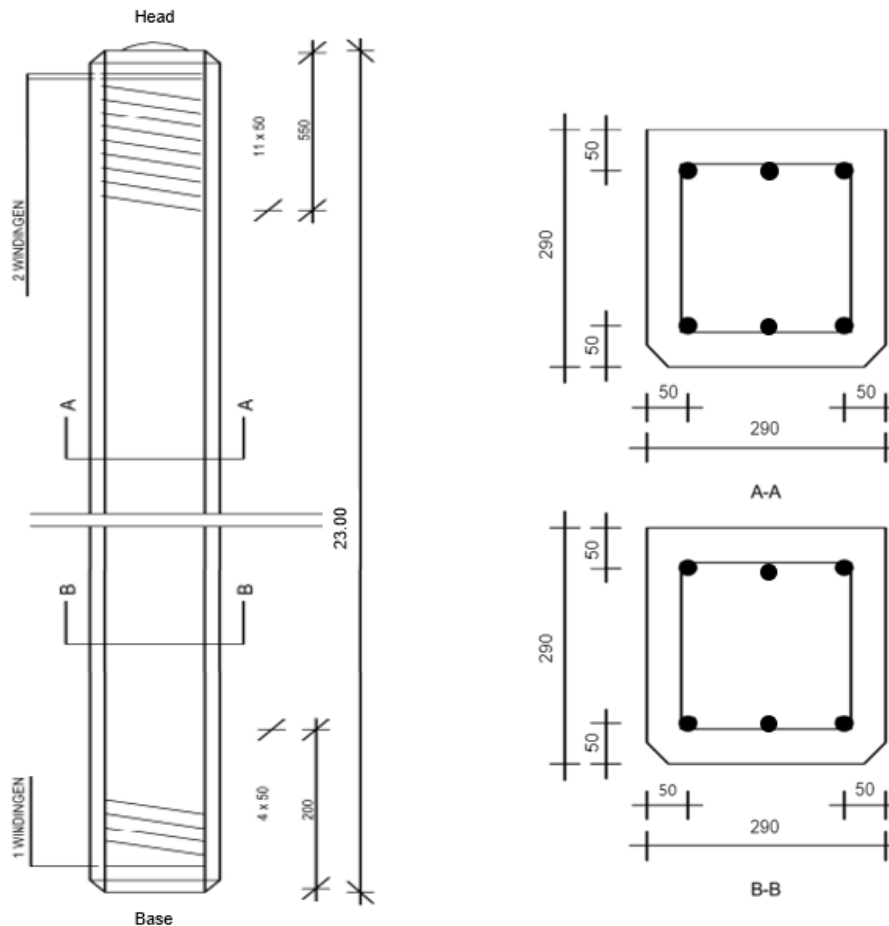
Design and dimensions prefab prestressed pile foundation Delft, total length of 23-meters
